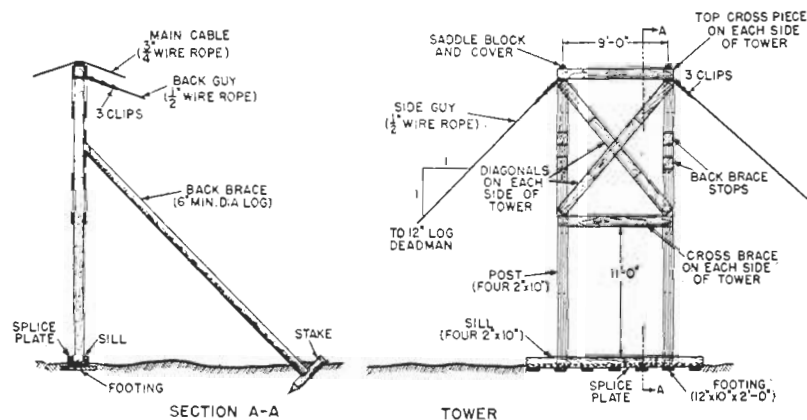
Prefabricated tower for suspension footbridge. Used for all spans greater than 140 feet when dimension lumber is available.
